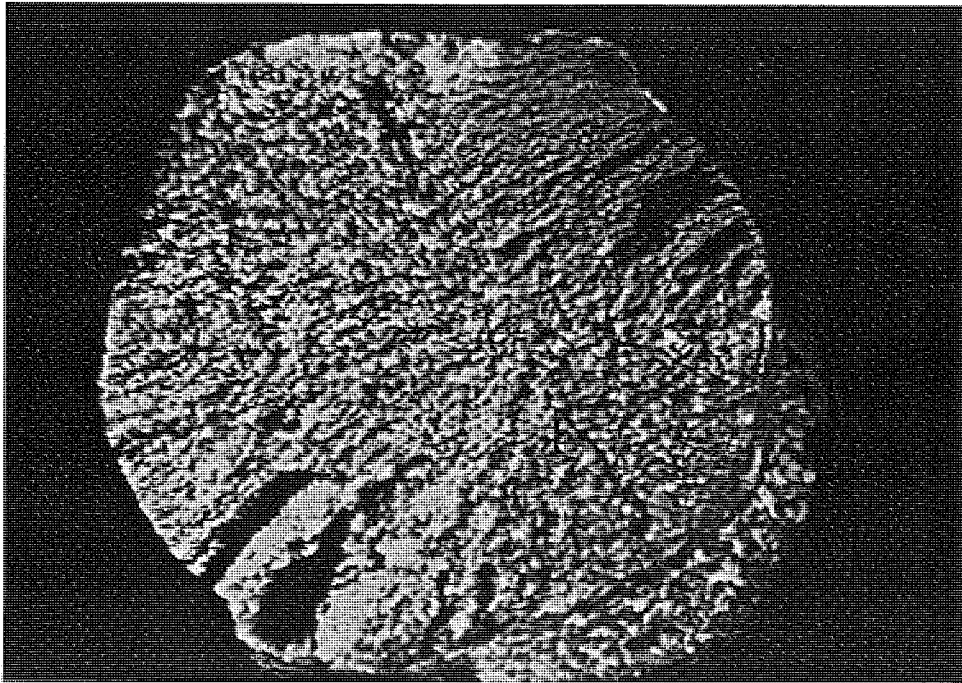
Fatigue Failure of a Steel Rebar (bar No. 13)
